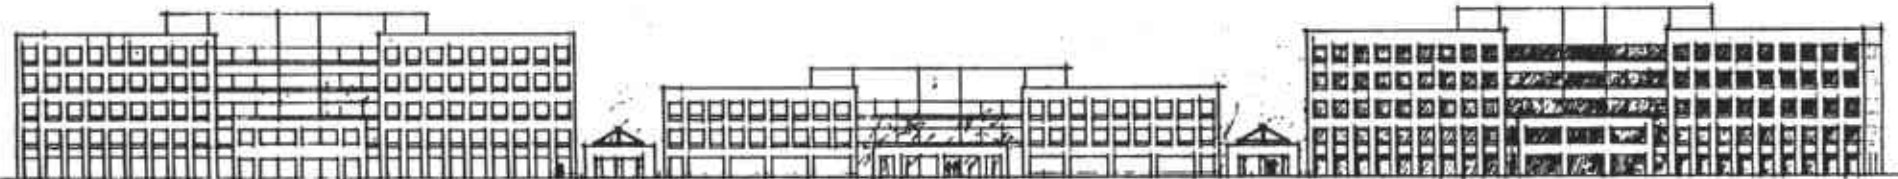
PLATE B: PROJECT STRUCTURES AS VIEWED FROM EAST OF THE SITE
